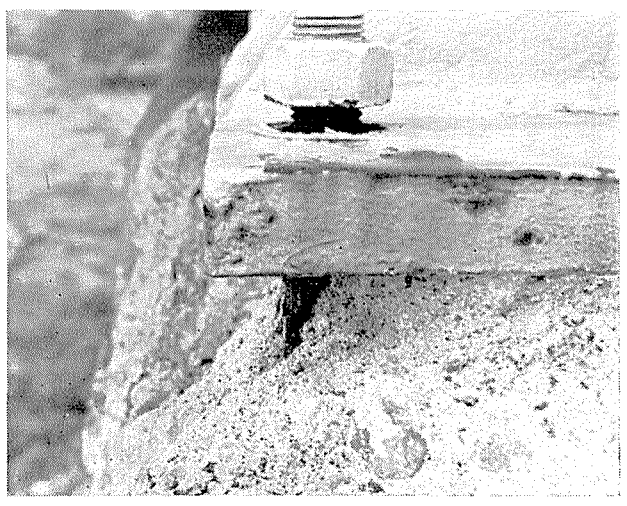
Pull-out of anchor bolt (Yasuda Bridge)
